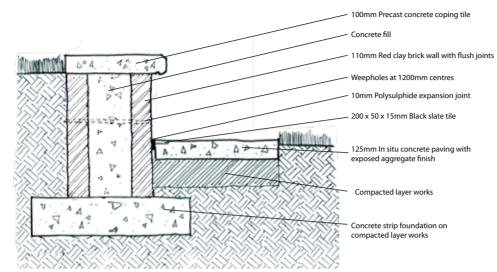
Detail D1 - Seating wall Scale 1:20
